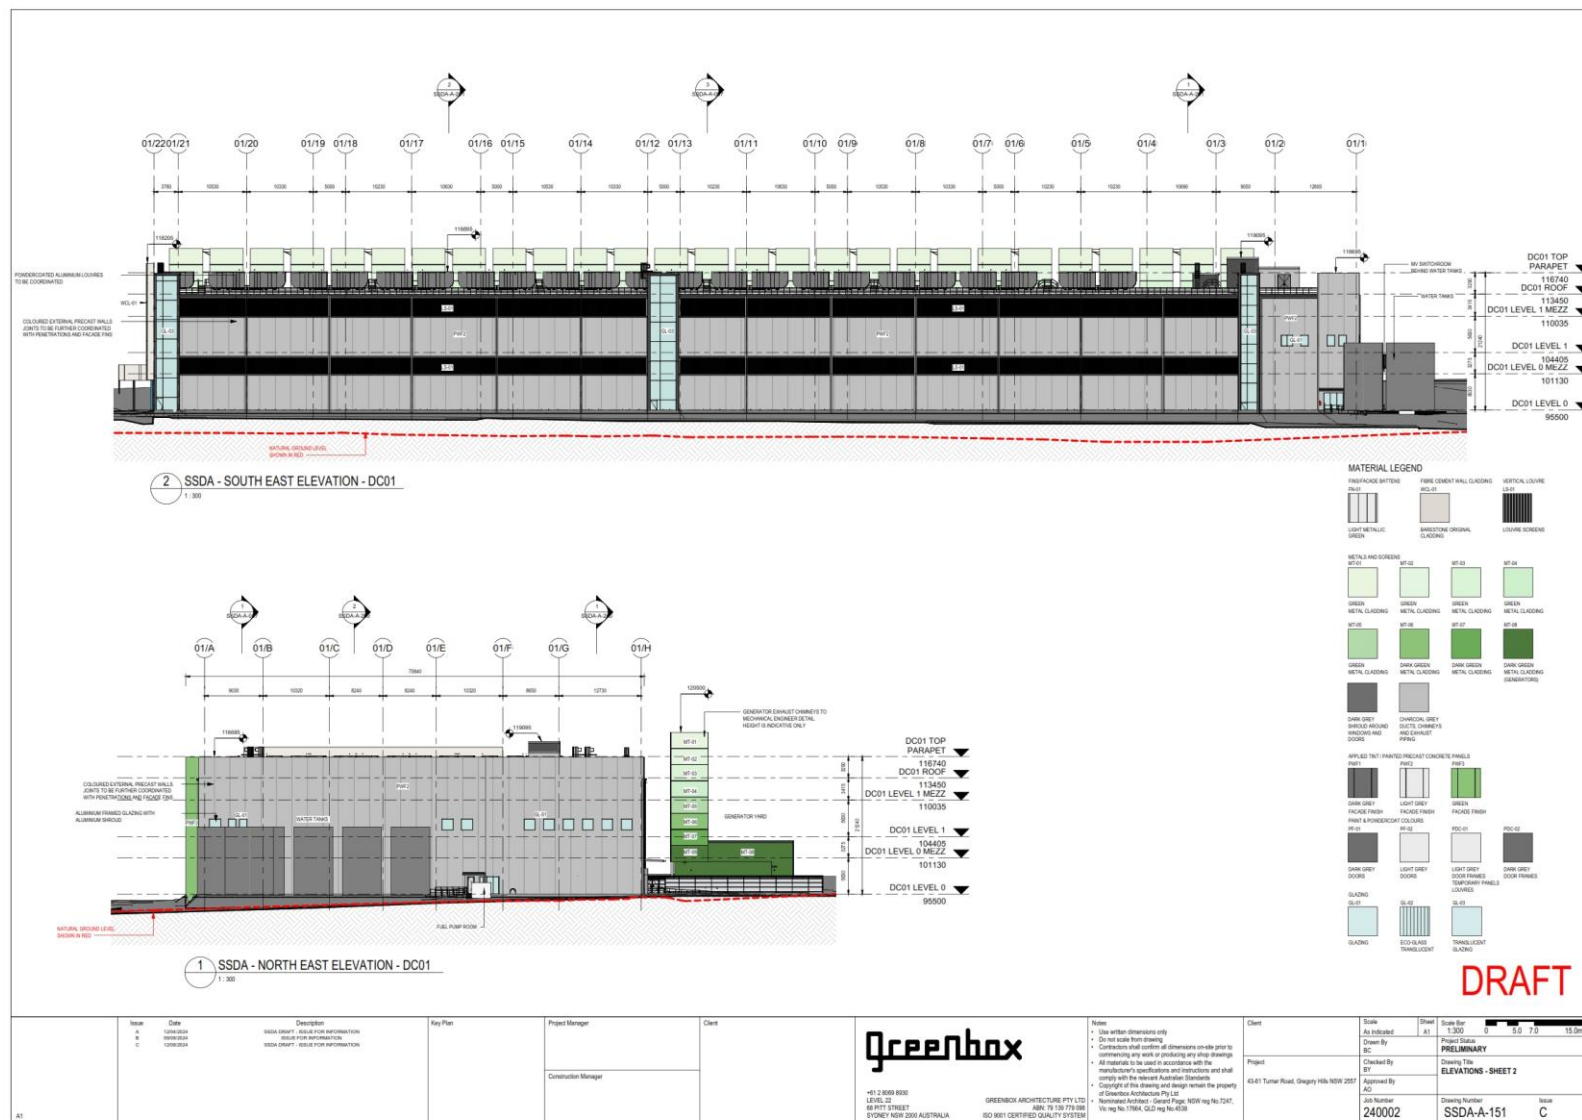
Proposed southeast and northeast elevation designs (Source: Greenbox Architecture 2024)
